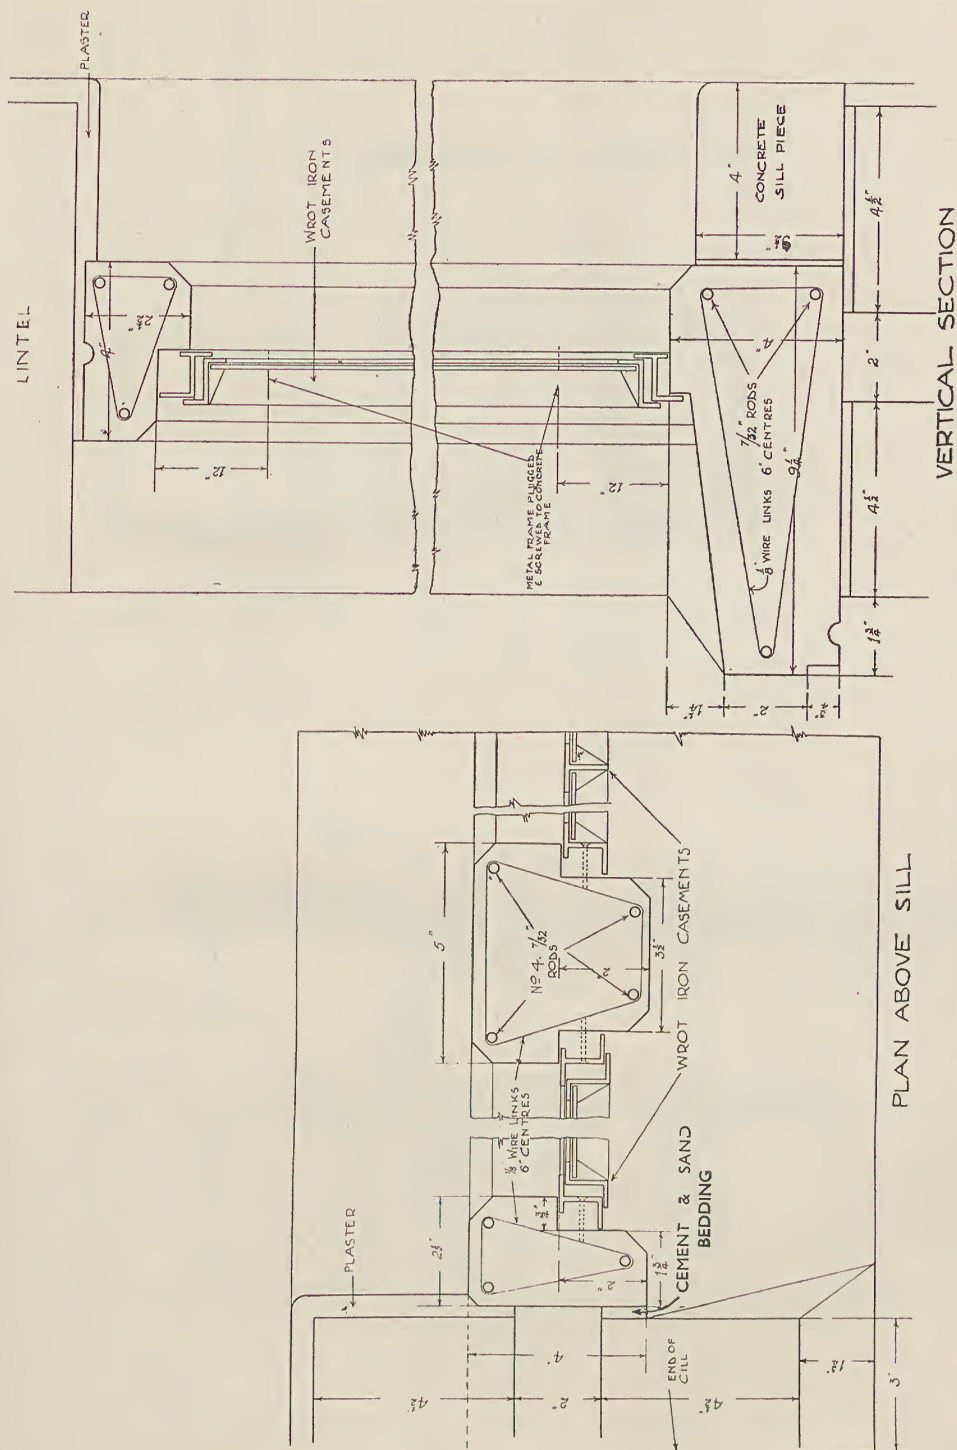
DETAILS OF CONCRETE WINDOW FRAMES AND SILLS.
